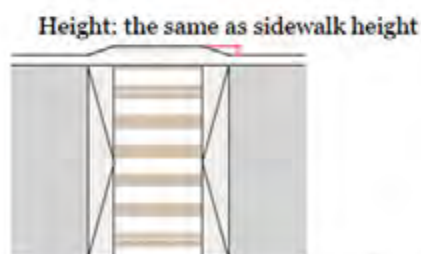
Dimensions of raised crossing (Layout & Section). Source: ITDP (2022)
